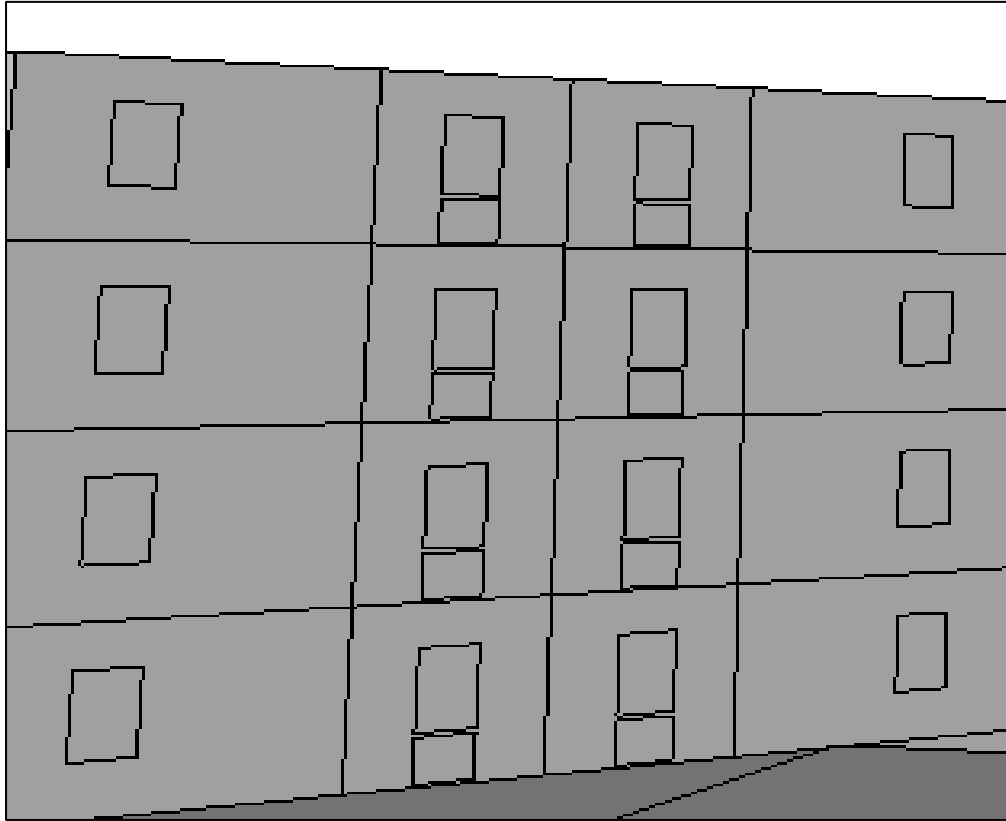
Windows achieving 1.5 hours of sunlight - North elevation of Building 01 (modelling software)
